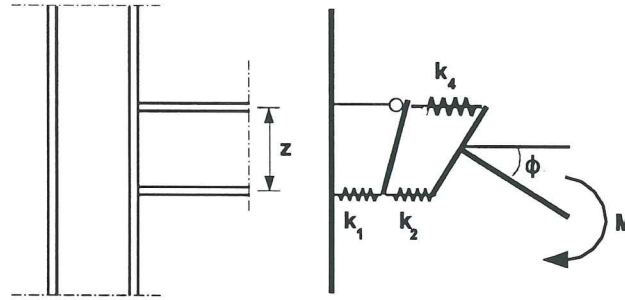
Spring model for an unstiffened welded joint
